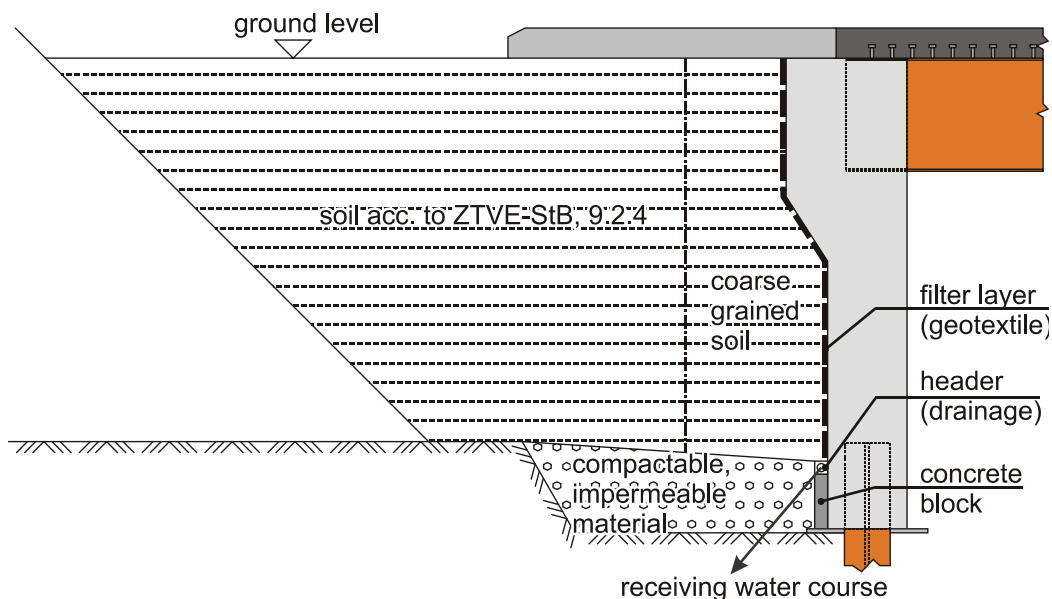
drainage of backfill acc. to (RiZ-ING, 2007), WAS7
